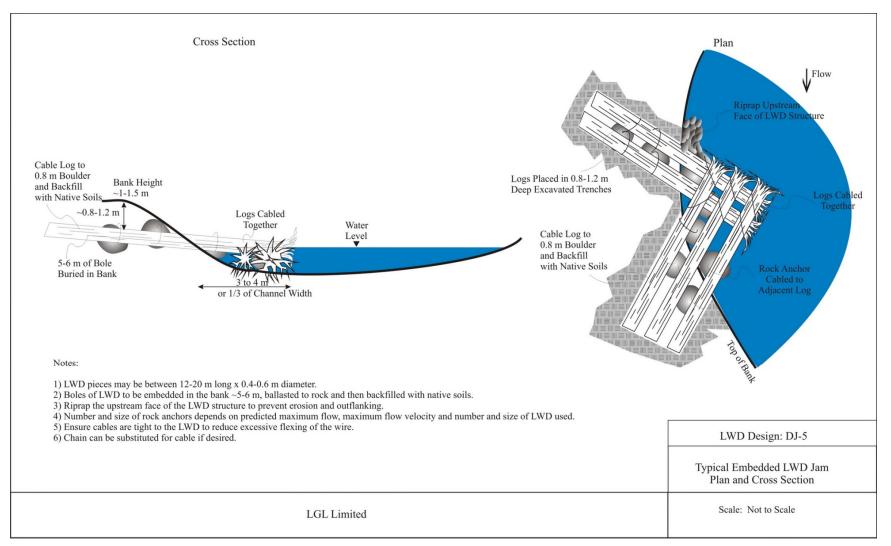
Typical plan and cross-section views of a large woody debris (LWD) structure, DJ-5.
